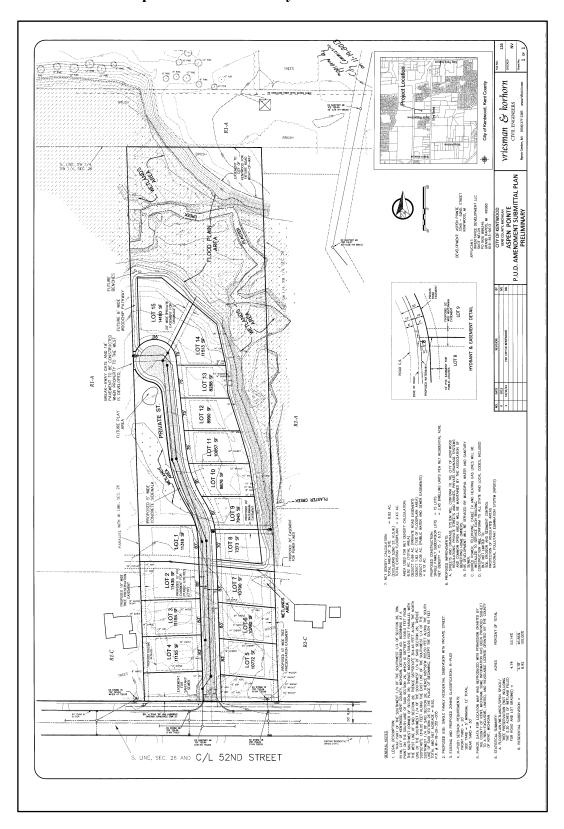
Case 15-13 Aspen Point Preliminary PUD Plan
